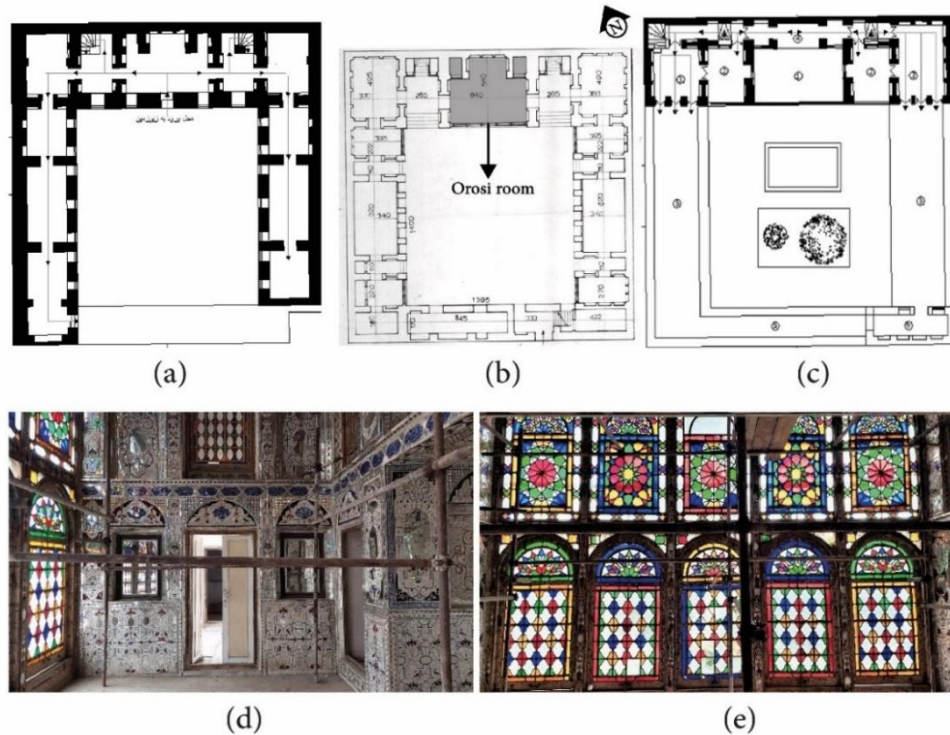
Orosi window in Kazeruni house: (a) Basement plan (b) Ground floor plan (c) First floor plan, (d) Shahneshtin (e) Orosi window from inside.
